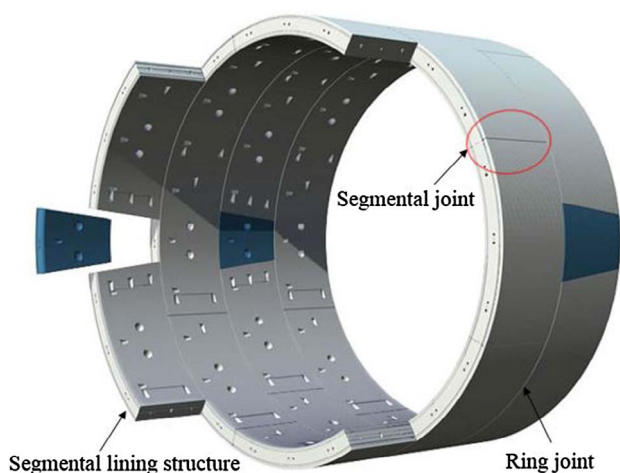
Sketch of segmental joints and ring joints of a shield tunnel.
